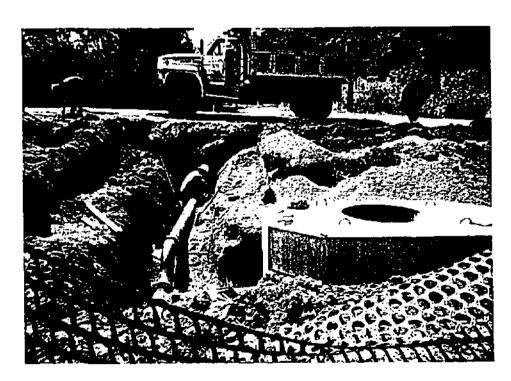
North Bloomfield, N.Y. 7/16/87. The RWW crew installing water main along Martin Road in the westerly direction.
